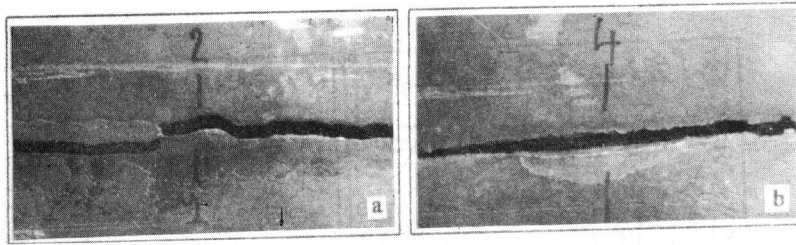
Gap view after failure in positions 2 (a) and 4 (b)
